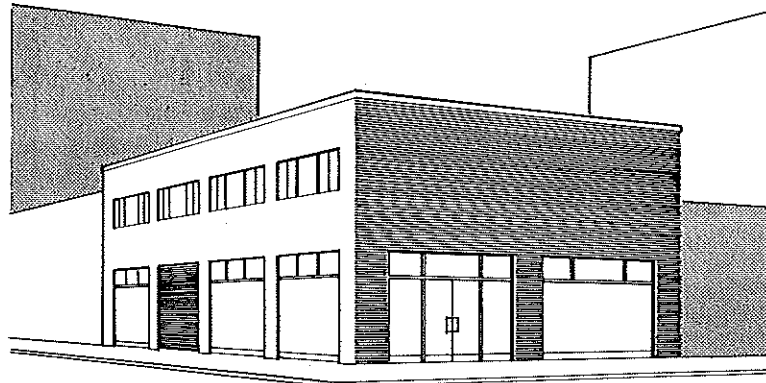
Perspective of store. The building may be modified by different arrangements of interior partitions, and by changing display space, counters, windows, and doors. The plan will vary with the type of store. From first to second floor is 12'-0"; second-floor ceiling height is 9'-0". The first floor is 4" reinforced concrete on 12" fill. The second floor will support 80 lb per sq ft. Outside walls are 13" thick. See Fig. 22.47 for truss and roof details. Heat is supplied from outside source.
